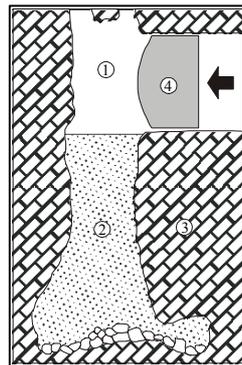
Cavern treatment by concrete filling for a TBM drive (Milanović, 2000). 1. Cavern; 2. Part of cavern filled by concrete; 3. Limestone; 4. TBM.
